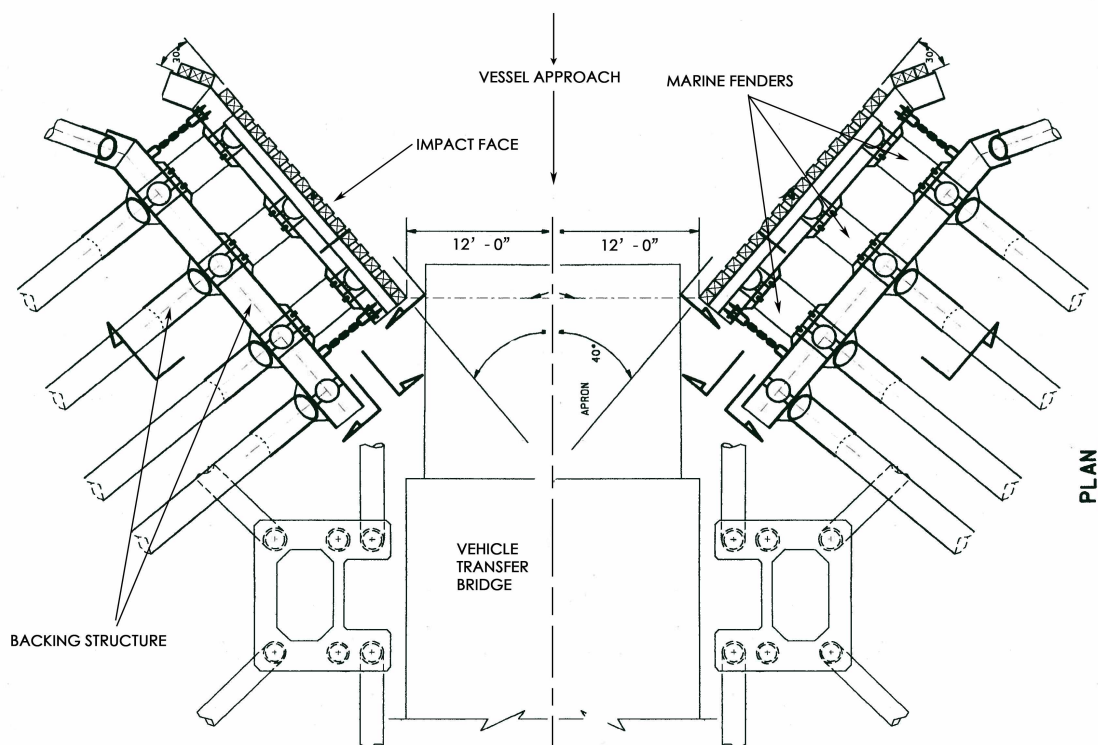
Bremerton slip As Built Drawing Plan View, courtesy WSF
